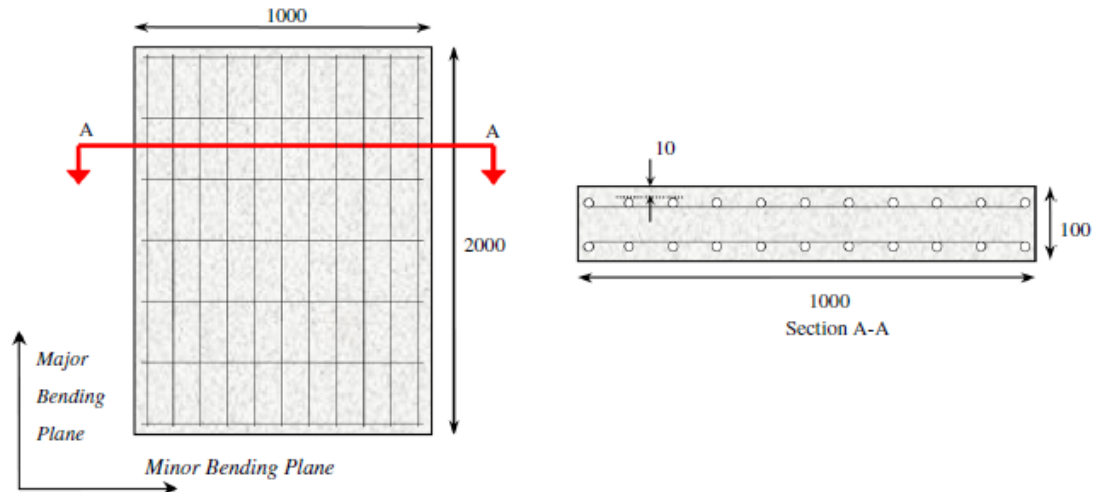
Geometry of the specimens (Unit: *mm*) (Wu et al. 2009a)
